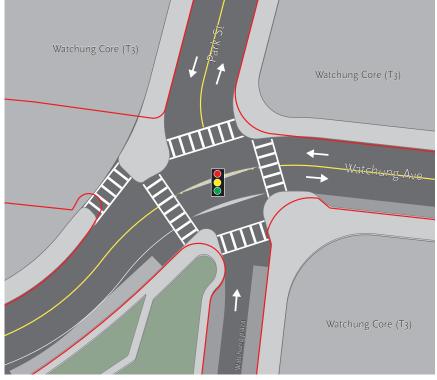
f: Recommendation for Park Street and Watchung Avenue intersection
